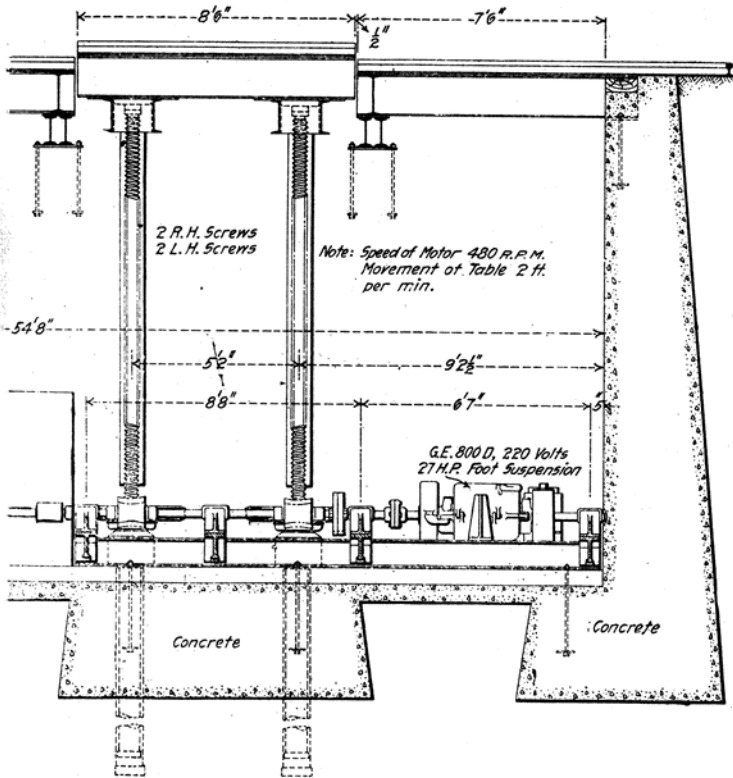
DETAILS OF ENGINE PITS AND ROUNDHOUSE FLOOR AT EAST ALTOONA, PA., P. R. R.
